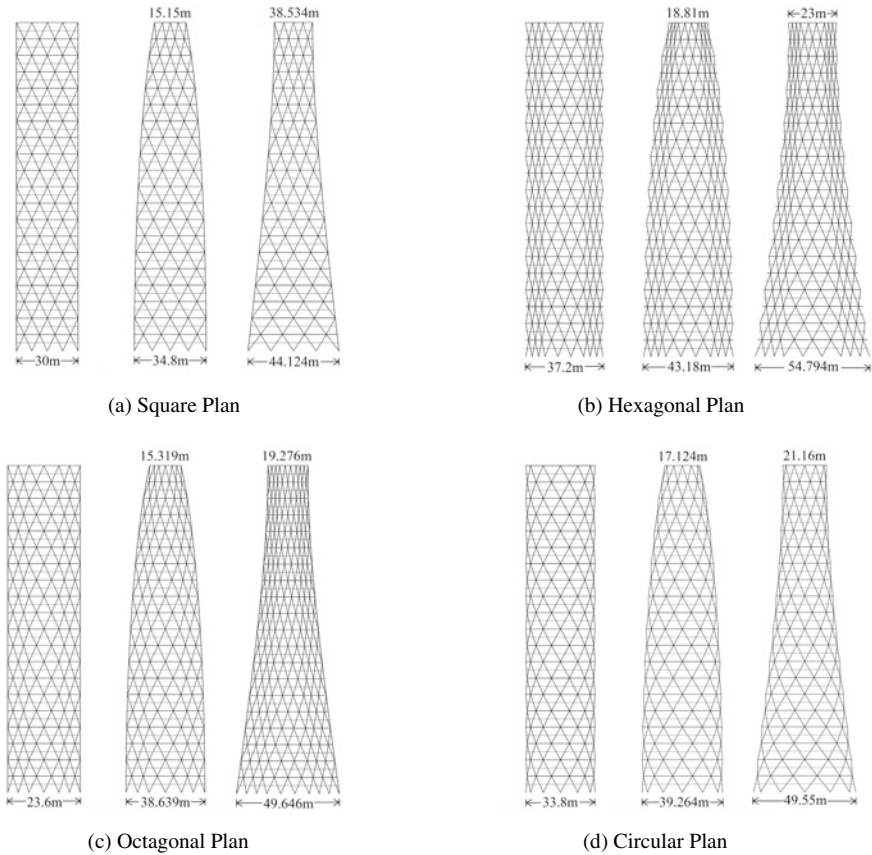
Analysis models with a square plan, b hexagonal plan, c octagonal plan, and d circular plan
